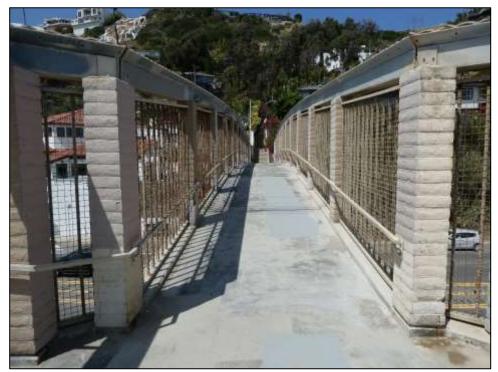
West elevation, camera facing northeast, May 17, 2022.
